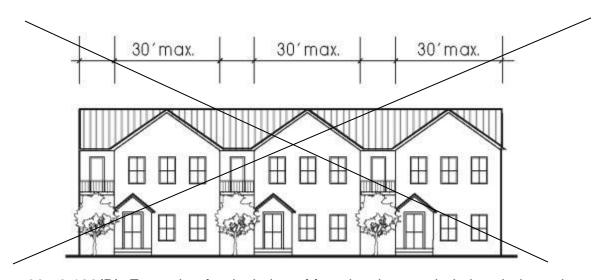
(D): Example of articulation of facades that can help break down the scale of large buildings.
